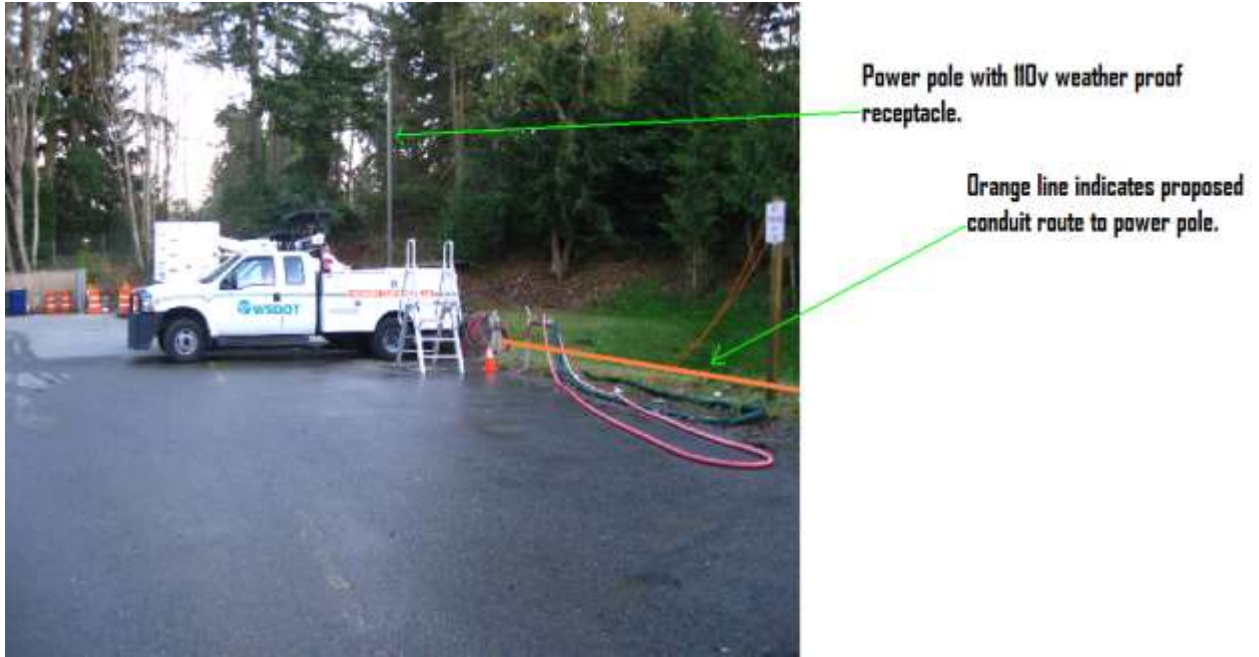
Light pole and proposed route for conduit at the Ballinger Maintenance Facility.
